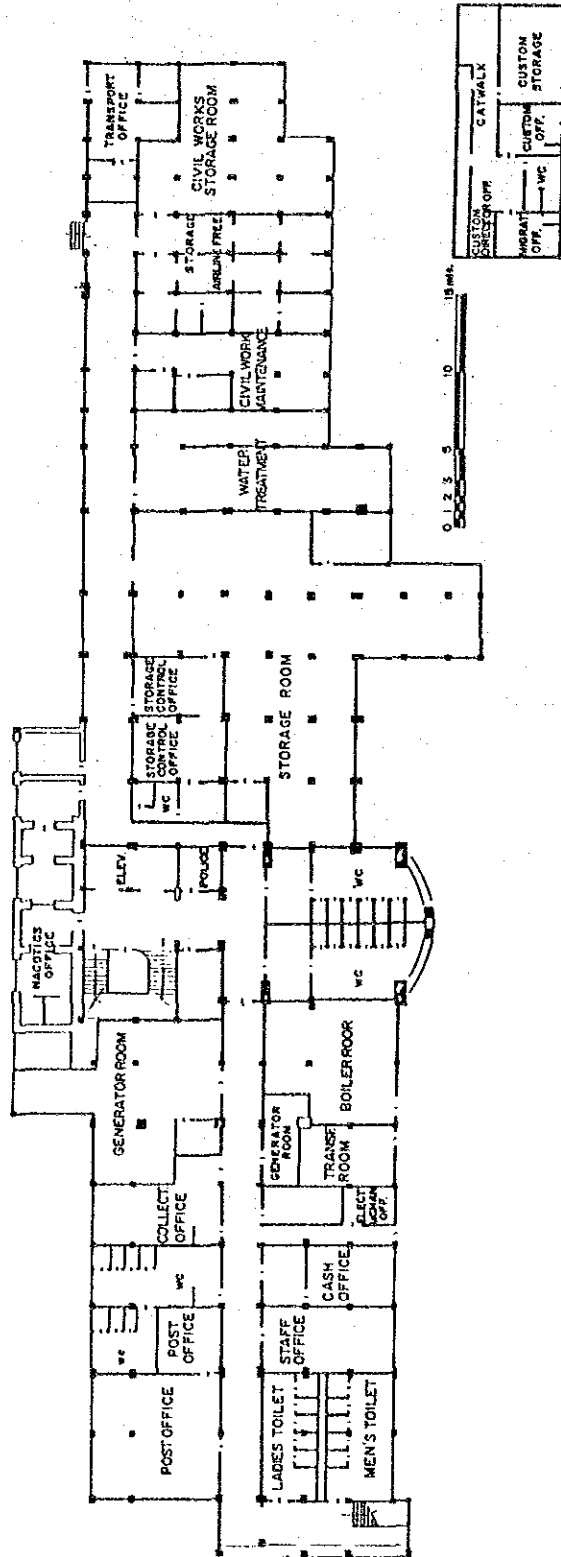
Basement Floor Plan of Existing Passenger Terminal Building
